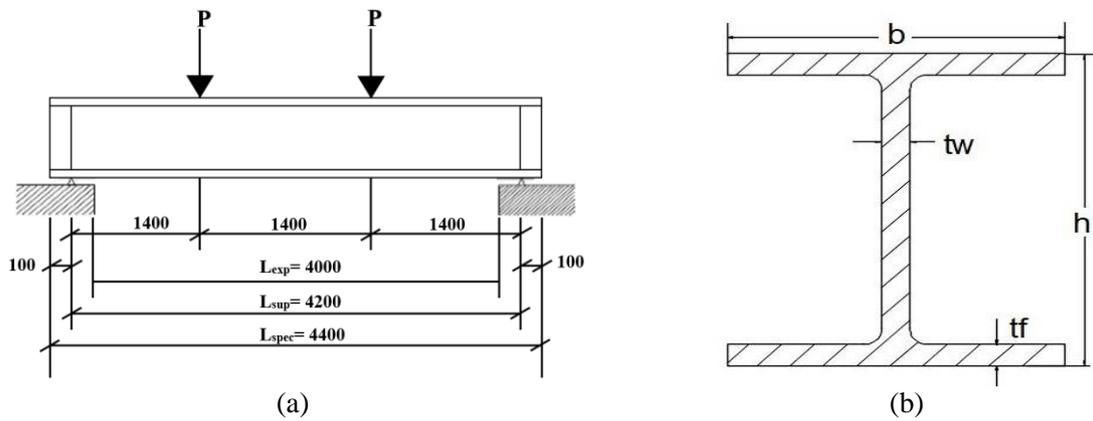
(a) Loading profile of the steel beam (b) Cross sectional of the steel beam
